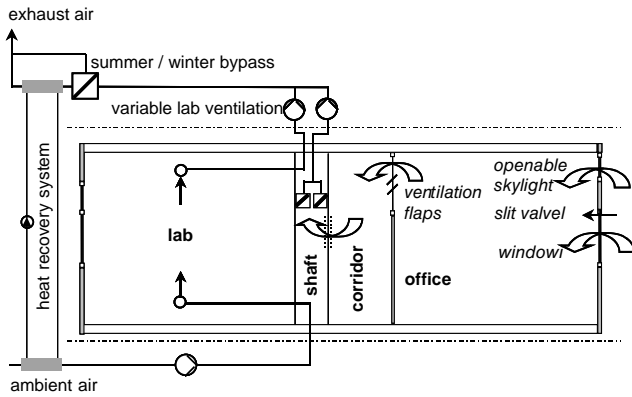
Ventilation of the office rooms with heat recovery in winter and night ventilation in summer. The air exchange can be intensified by single-sided ventilation (windows).
